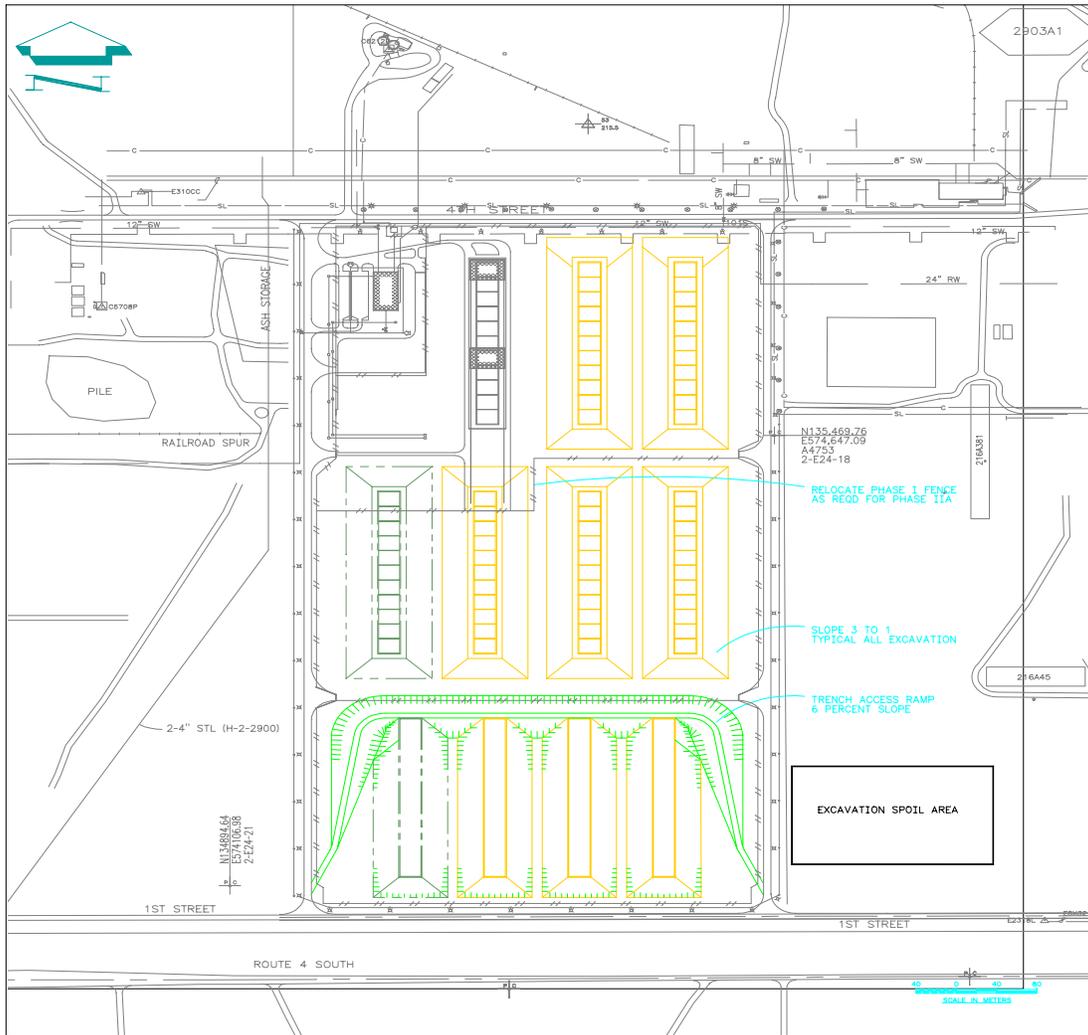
New Disposal Facility Catch Basin and Leachate Collection System
